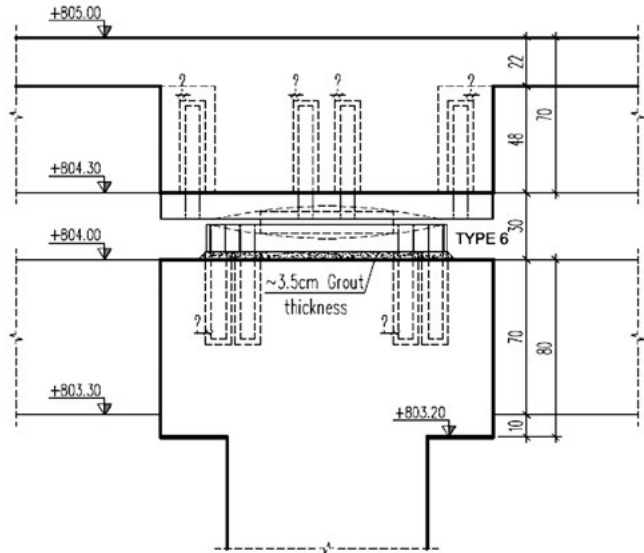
SIP D isolator on plinth with upper structural slab and grout joint
